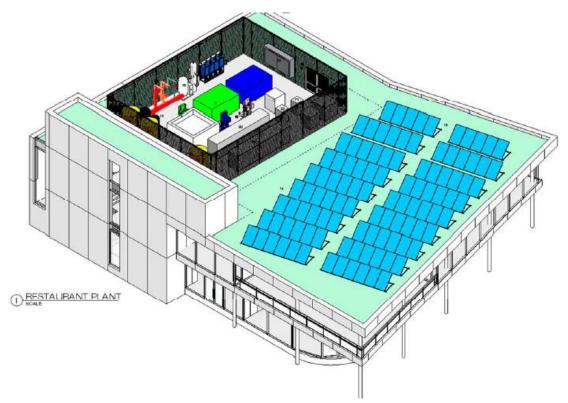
Proposed Café, Retail and Restaurant Roof Level Plant Area
